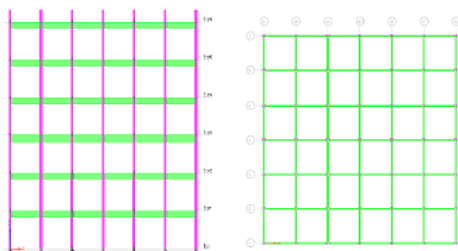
Column Elimination Location , exterior and interior columns
